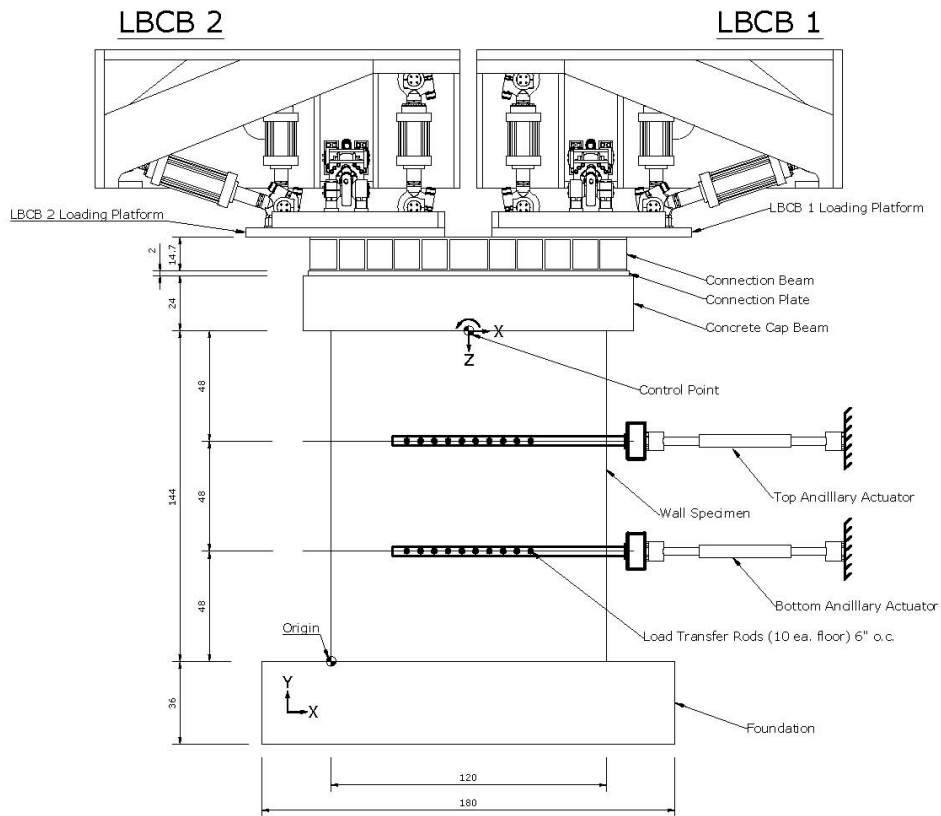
Structural Wall Test Setup (Lowes et al. 2011).
